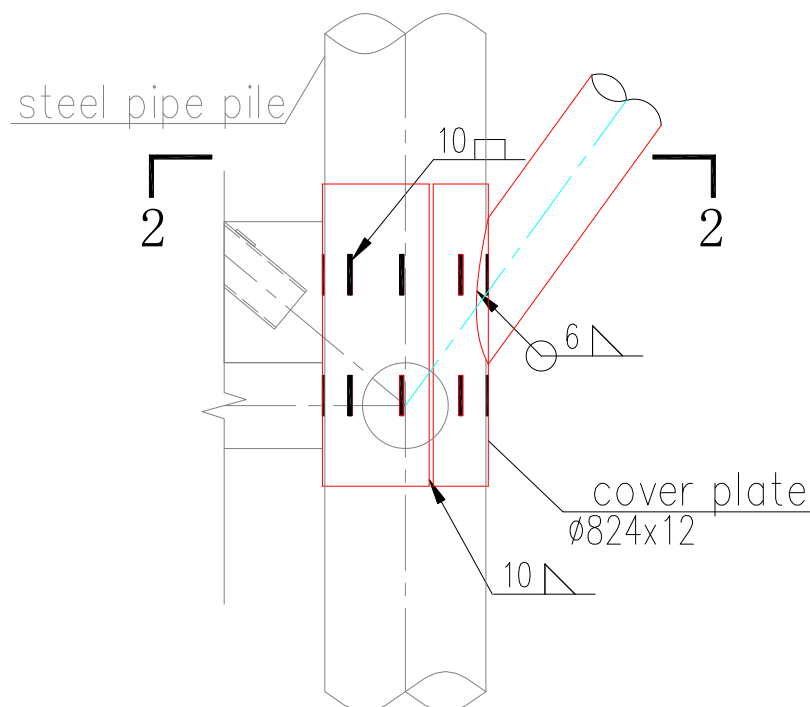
The structure diagram of the steel pipe for local reinforcement
